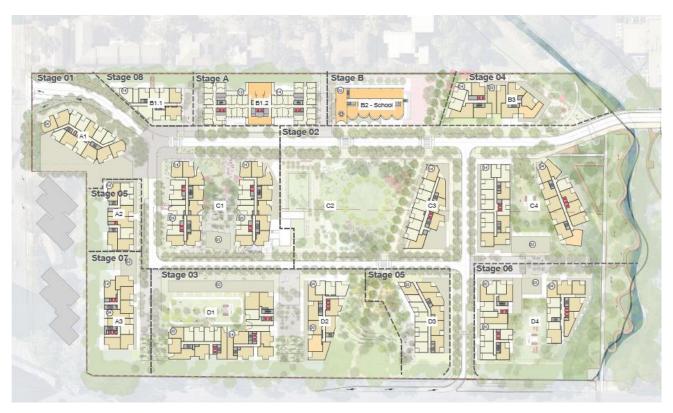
Ivanhoe Estate Masterplan (Stage 1)
